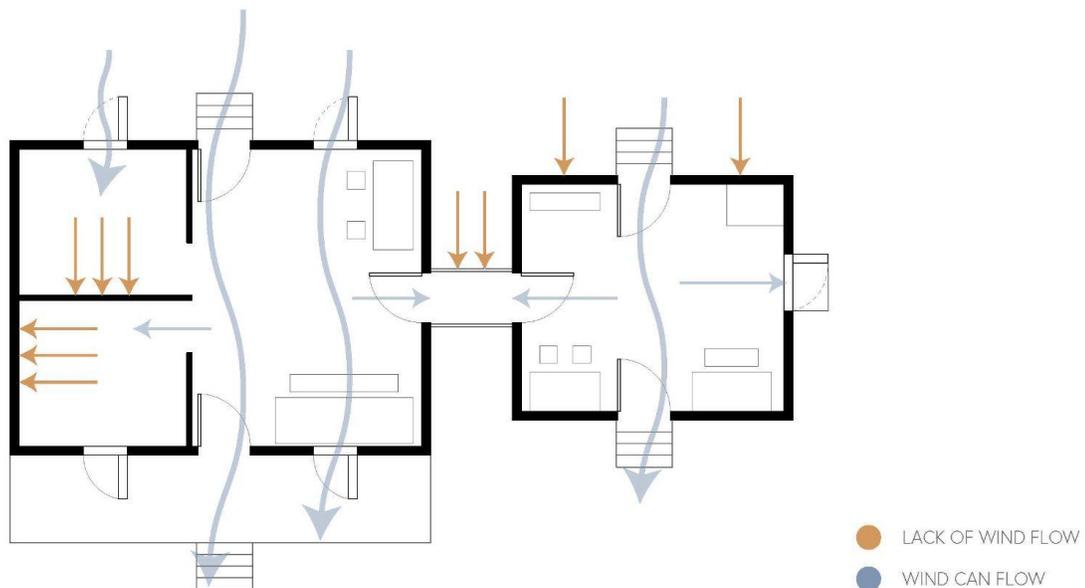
, Existing Floor Plan: Lack of Wind Flow (Source: Author)
